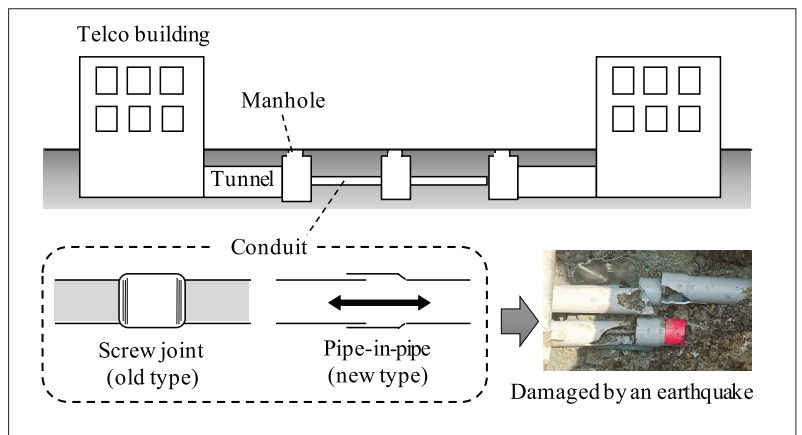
Underground telecommunication facilities with conduit structures and damages.
